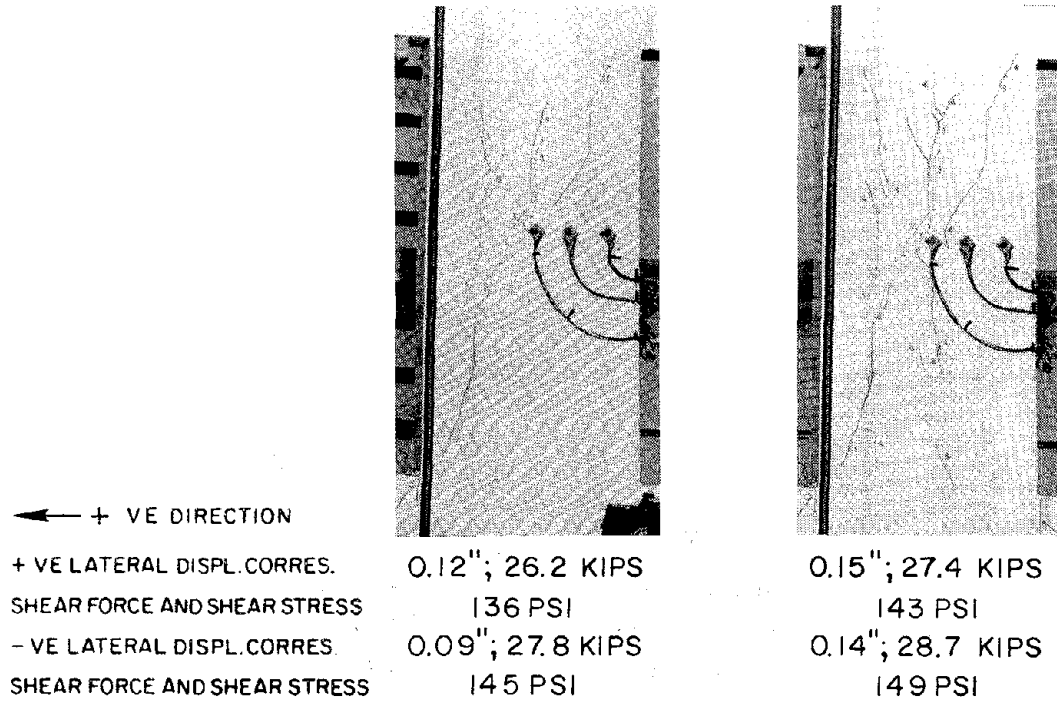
SUCCESSIVE CRACK FORMATION TEST 9. (RIGHT SIDE PIER)
